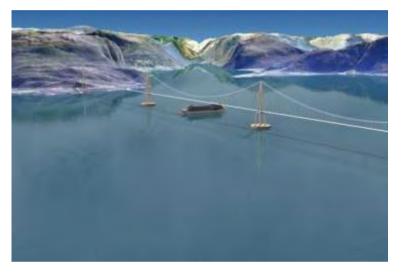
Floating bridge with suspension bridge on floating pontoons (Ill: Aas-Jakobsen)
